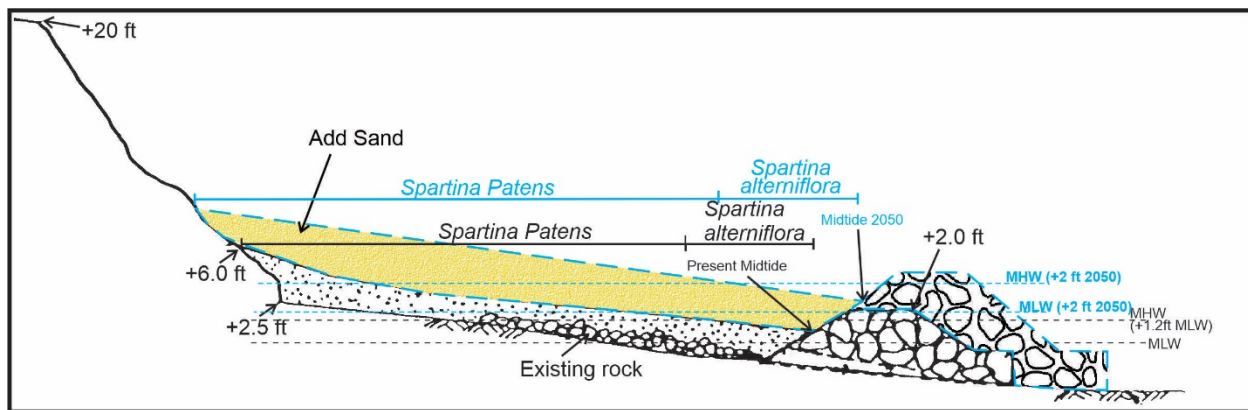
A high bank sill system (Jefferson Patterson) typical cross-section showing the design conditions at the site as well as the projected 2050 tide level (blue). Rock and sand can be added to the system to maintain its effectiveness. To not squeeze the system, rock would need to be added to the outside of the structure. After Hardaway et al., (2018).
